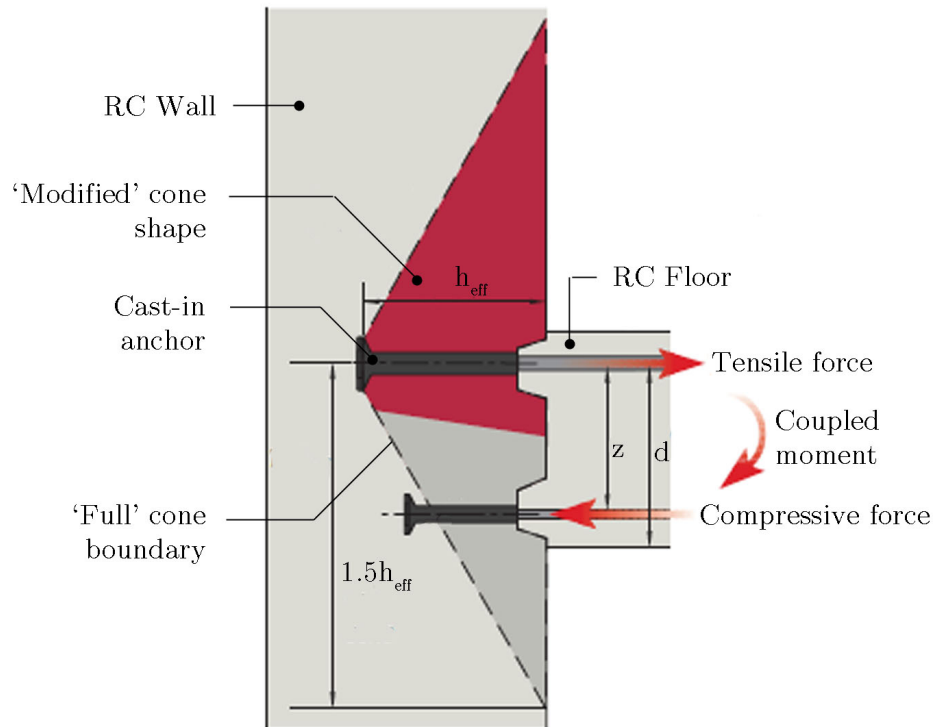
Modified Cone Failure for Cast-in Anchor in Moment Connections (reworked from Ancon Building Products (2014))
